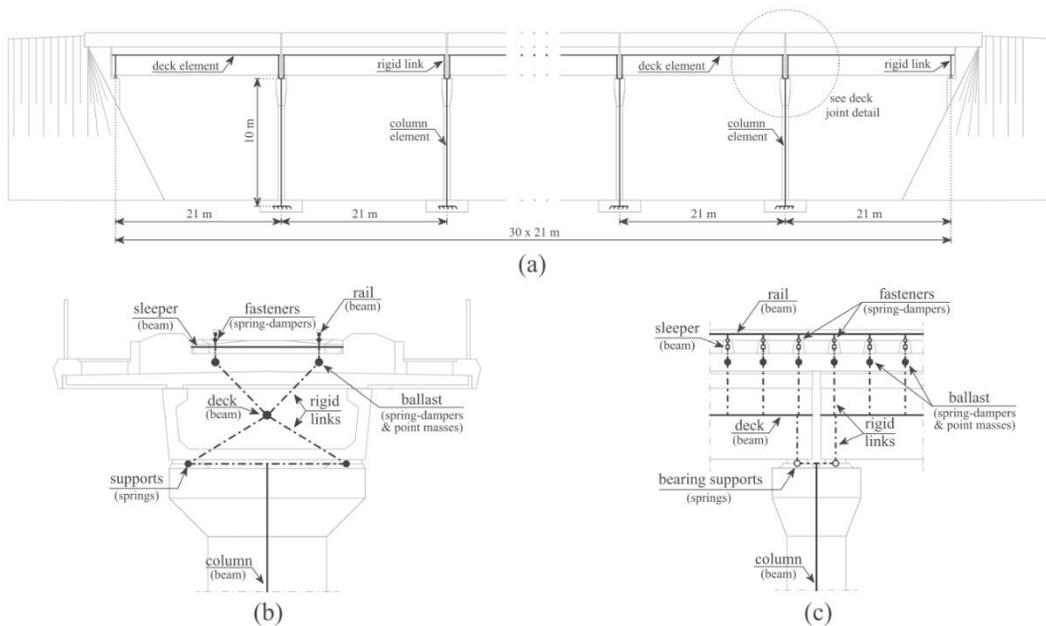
Example FE model scheme: a) elevation view b) cross-section c) deck joint (Montenegro et al. 2015).
